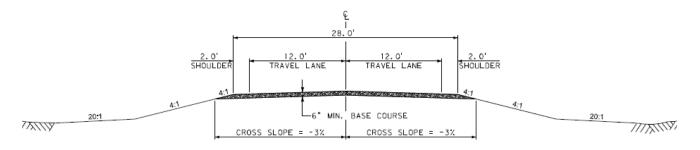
Standard Low Speed Gravel Road Typical Section
